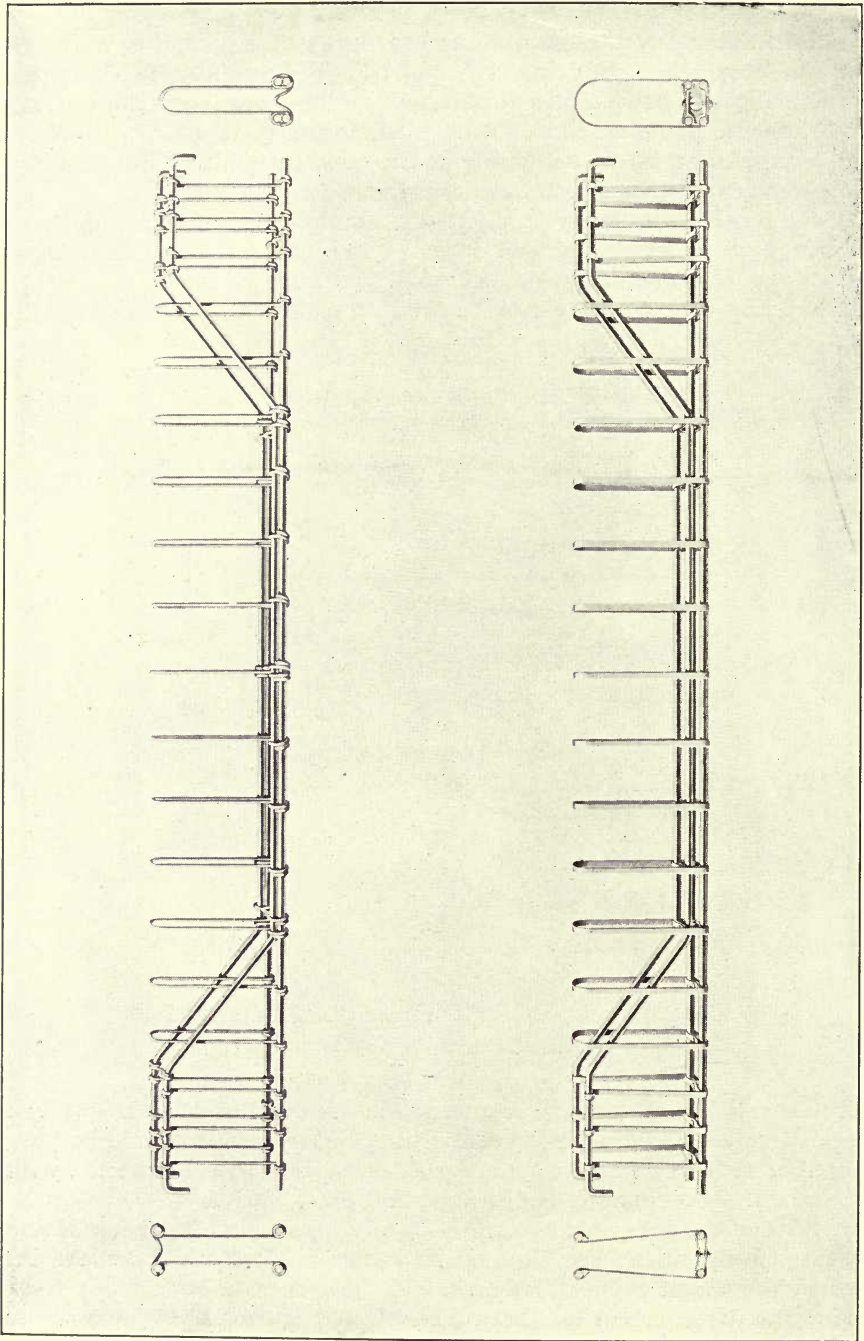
Unit Girder Frame System. (Sec. p. 188.)
